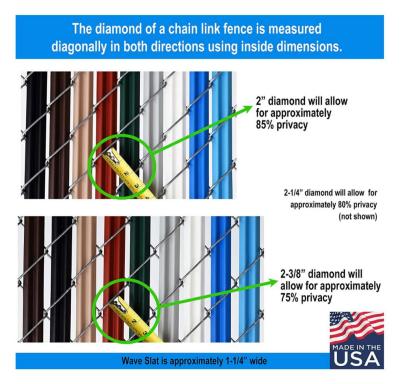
Applicant's proposal to make the existing fence sight-obscuring. Image provided by applicant's architect.
